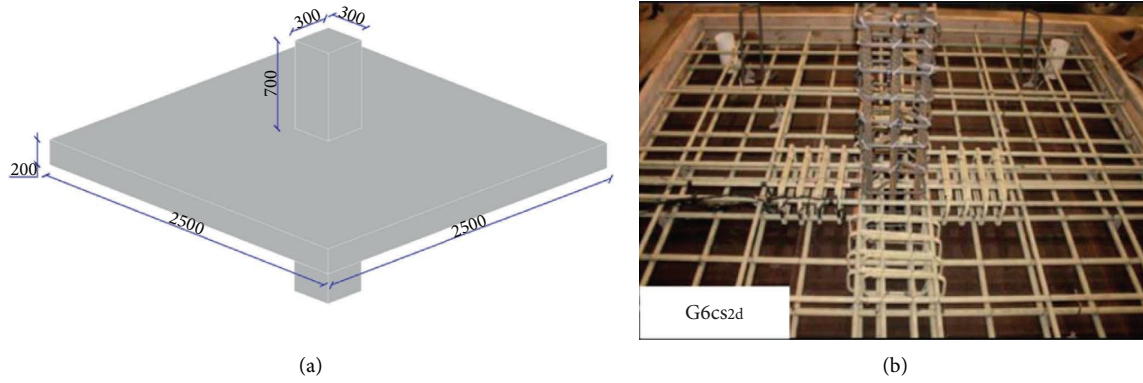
Geometry and reinforcement configuration of part-I slab-column connection specimen [3]. (a) Geometry (mm). (b) Reinforcement detailing.
